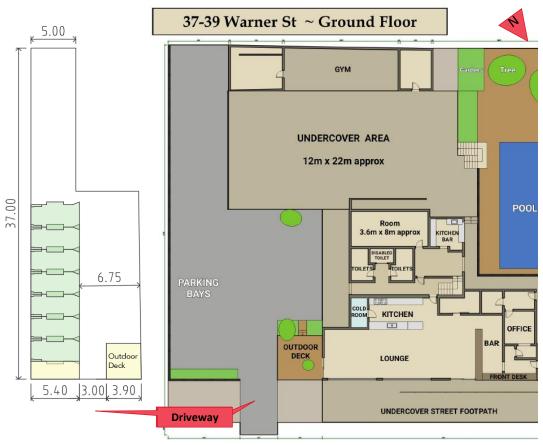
Port Douglas Backpackers – Parking area (l. dimensions based on google maps, r. Ground floor plan)
